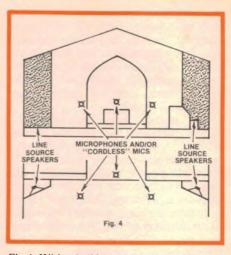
With a building having a low ceiling, a decorative false wall across the corners can provide ample accommodation for a good quality line source system and may be preferred to exposed enclosures.
